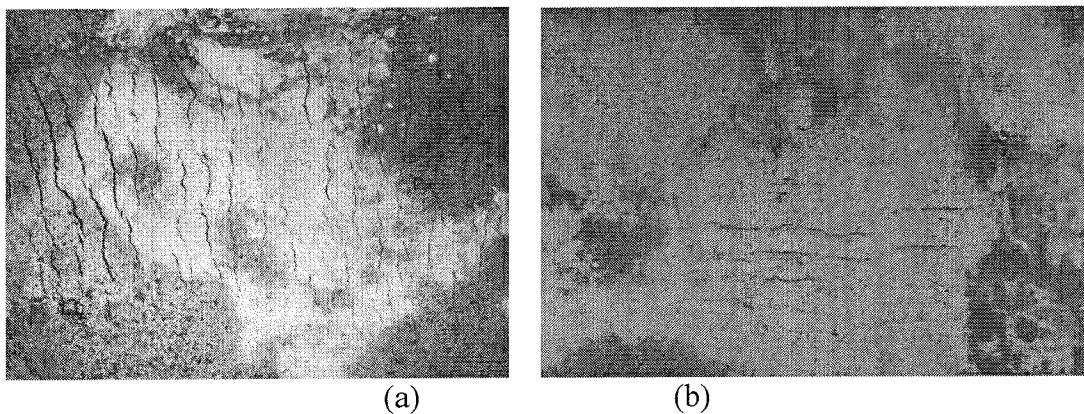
Sand Compacted by (a) Steel Drum Roller and (b) AMIR Roller
